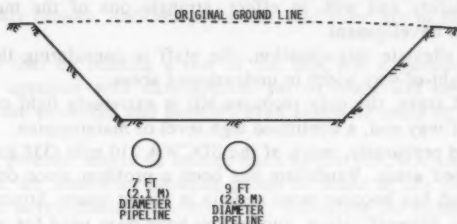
Highway-Type Cut for Pipeline Installation Through Proposed Area-Wide Shopping Center; Development Adjacent to Right-of-Way is Now Residential
